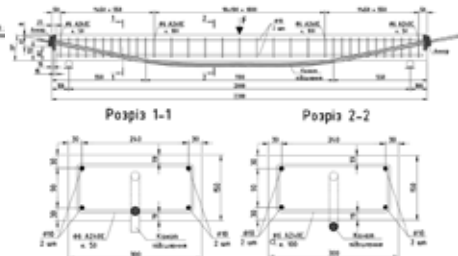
Structural diagram of a reinforced concrete beam reinforced with prestressed reinforcing wire
